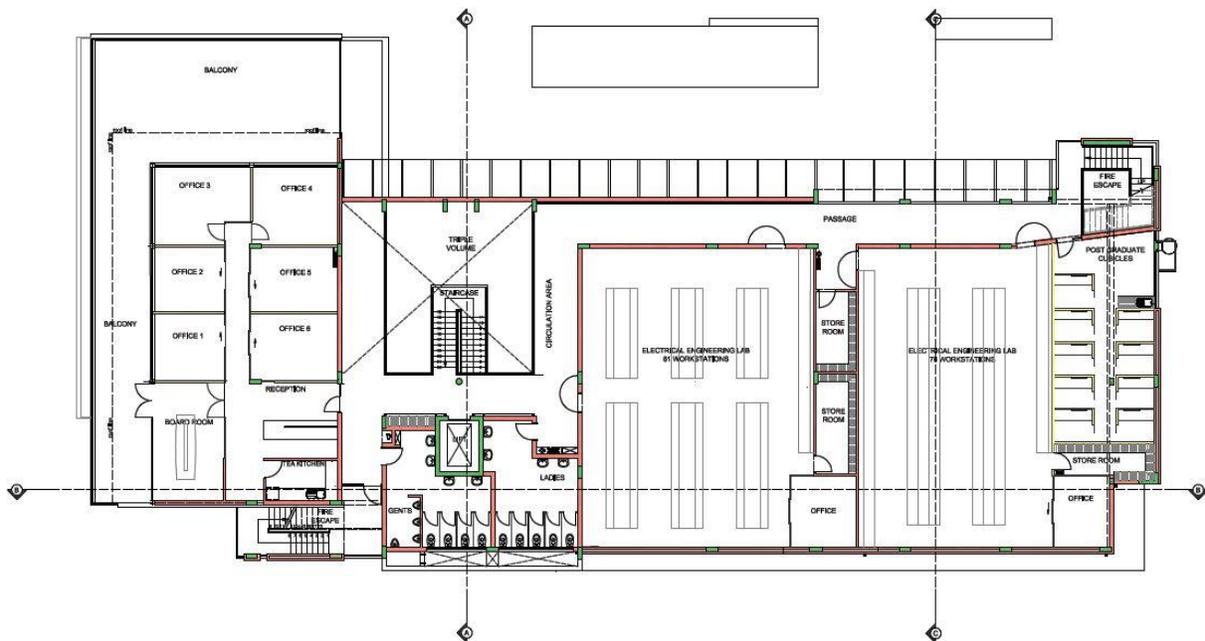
Second Floor Plan of the Engineering Technology Building (ETB) on the Central University of Technology (CUT) campus in Bloemfontein
